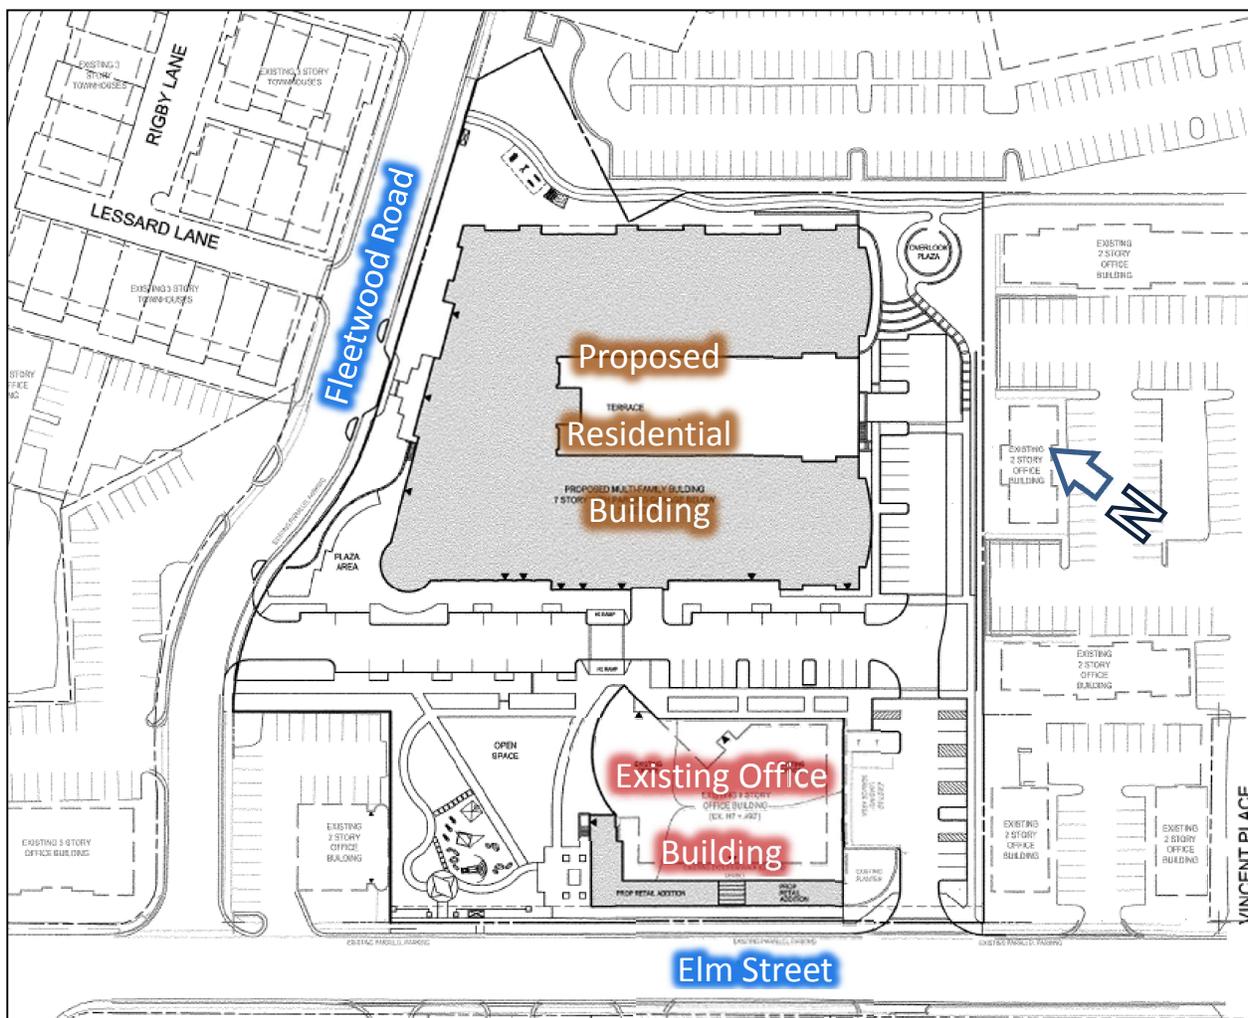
The proposed development plan (Source: Bowman Consulting, June 1, 2014)
